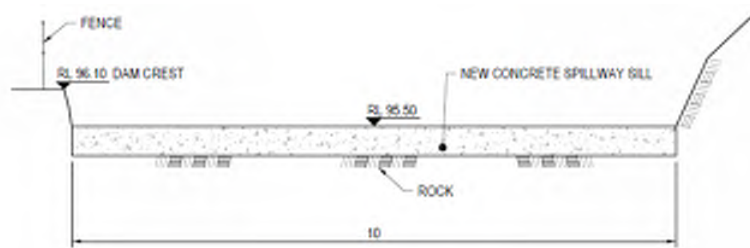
Cross section of concrete spillway crest – Option 1D
